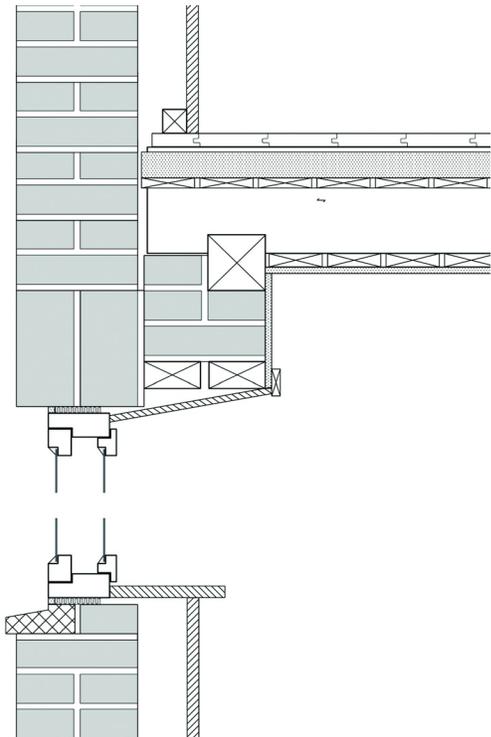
Vertical section of the joint between the load-bearing exterior wall and the horizontal division at the window wall.
